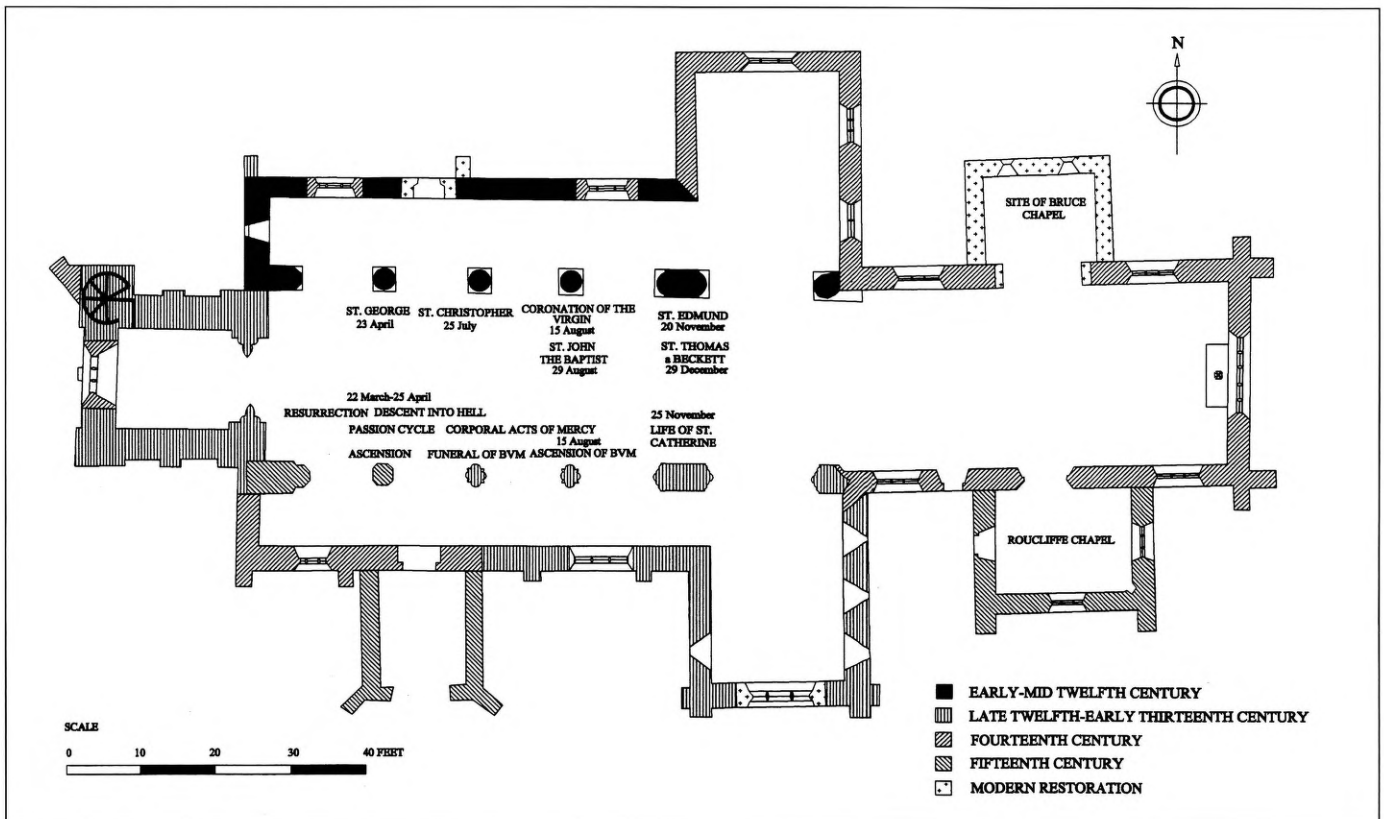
Ground plan of St Peter & St Paul's Church, Pickering (Illustration: K Giles after VCH)
